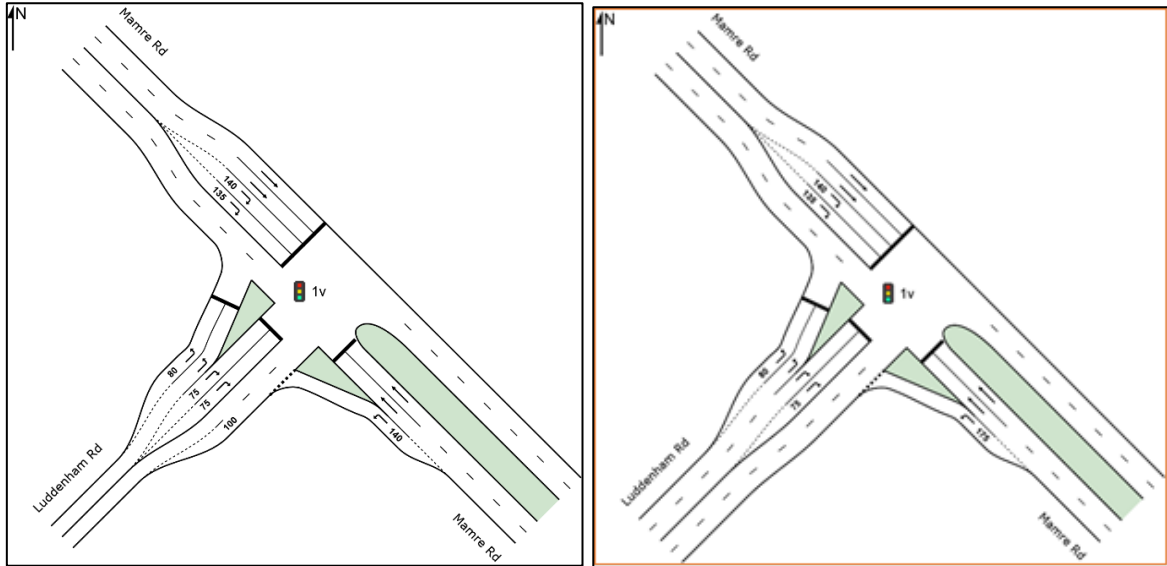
2026 and 2036 Mamre Road & Luddenham Road intersection layouts
